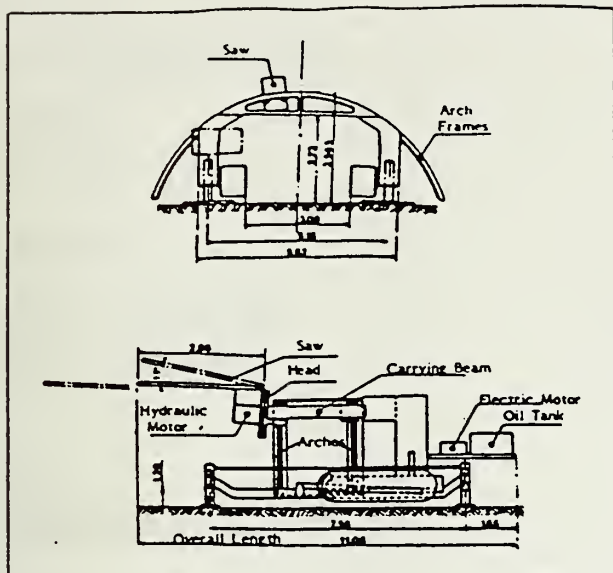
General layout of typical premilling machine (Hydraulic arm for shotcreting not shown).
